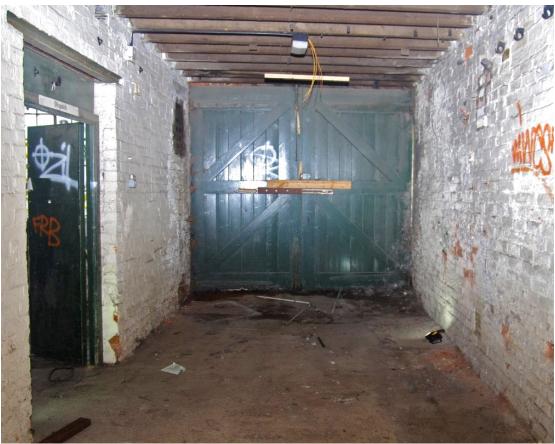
Northern end of passageway between Buildings R and T Looking north-west towards Coleshill Road gate. Building R on right
